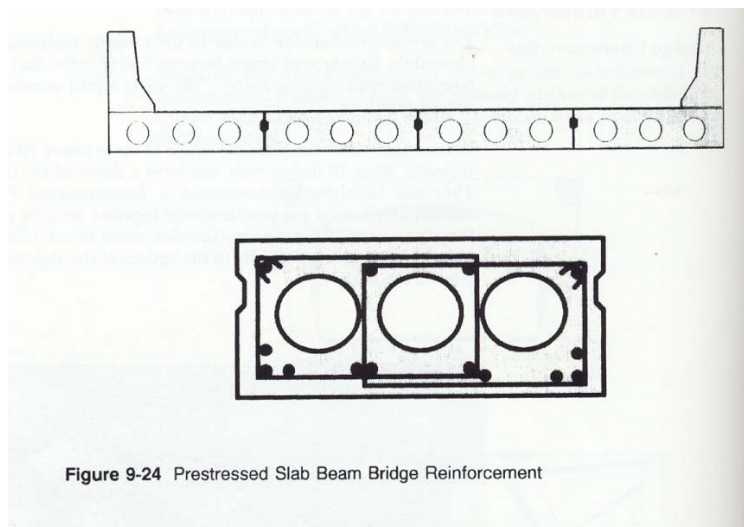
Prestressed Slab Beam Bridge Reinforcement
